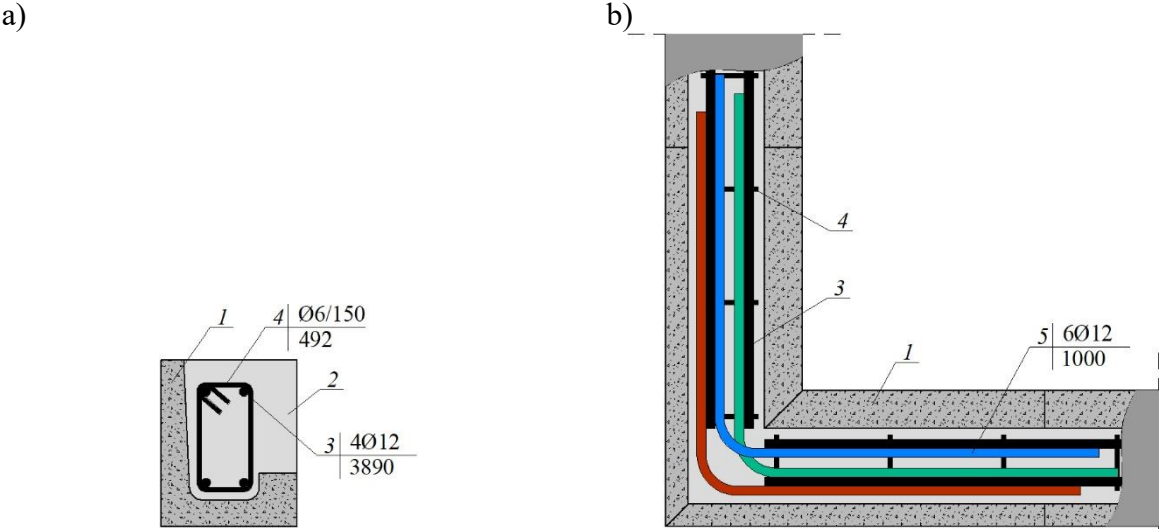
Design of construction details: a) reinforcement of bottom beam, b) corner reinforcement: 1 – L-shaped precast element, 2 – concrete, 3 – bar reinforcement, 4 – stirrups, 5 – corner reinforcement
